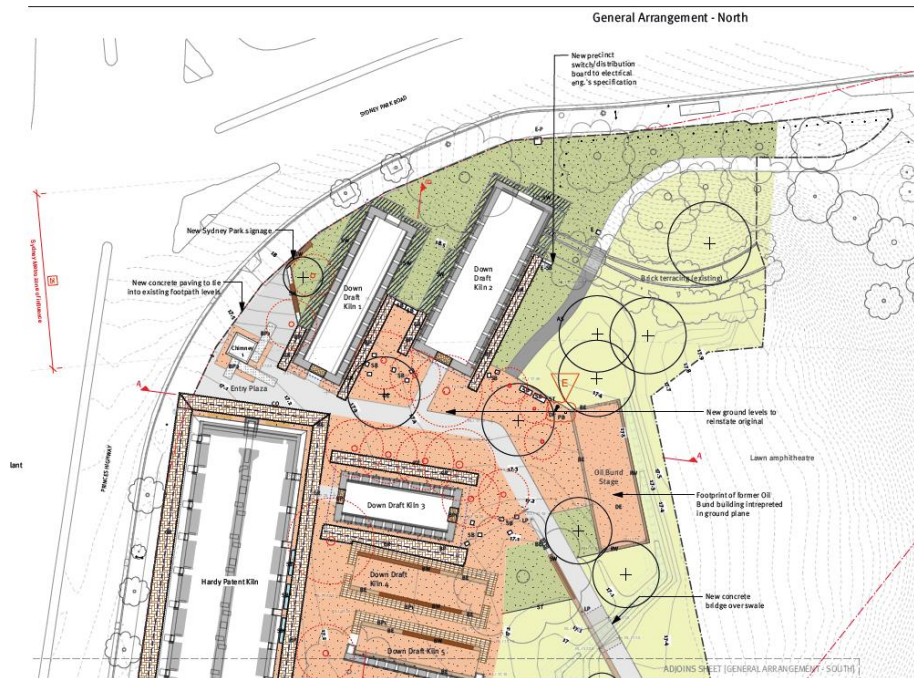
Proposed General Arrangements Plan for the north of the site. The plan shows proposed tree plantings and new footpaths, including the through-site-link.
